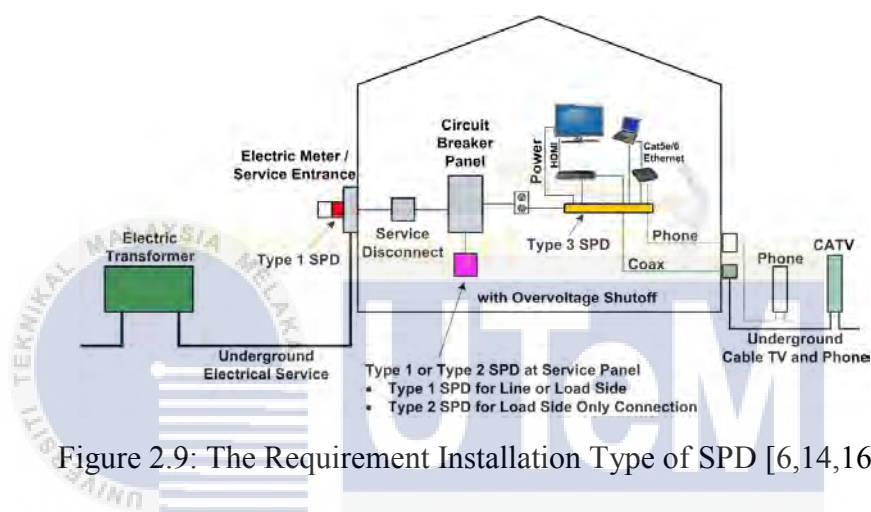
The Requirement Installation Type of SPD [6,14,16].
